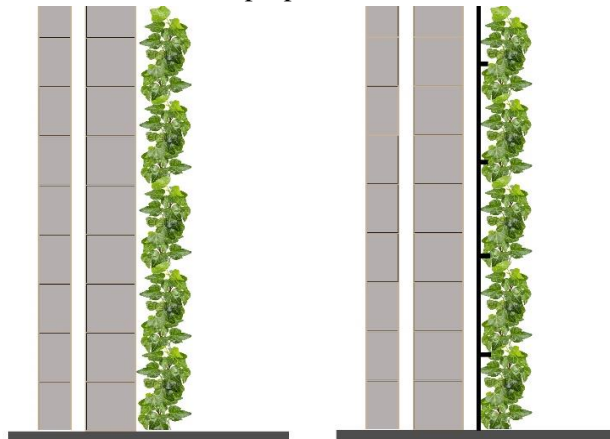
Green façade using plants rooted in the ground - use of self-climbing plants, a) directly on wall, b) with supporting structure ⁶
